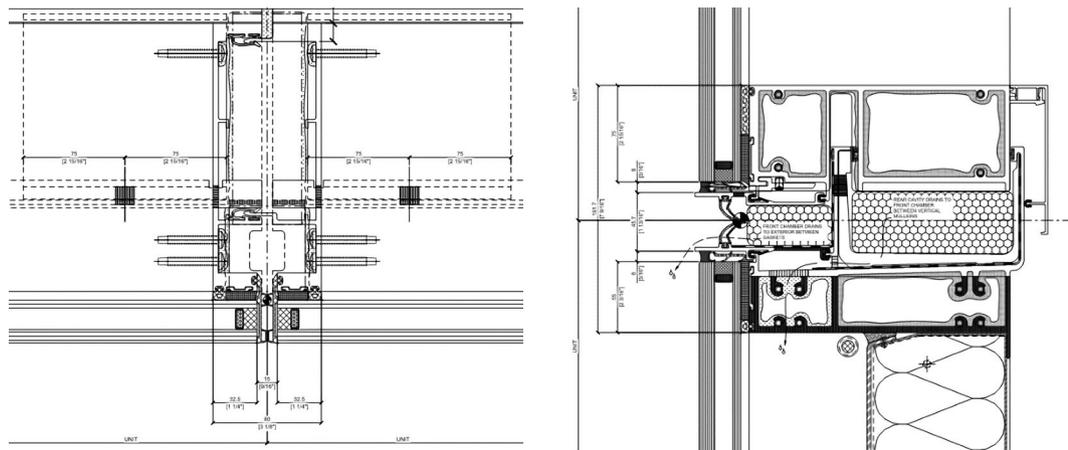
Typical KoP façade details. Left – Typical mullion, Right – Typical Stack Joint.
